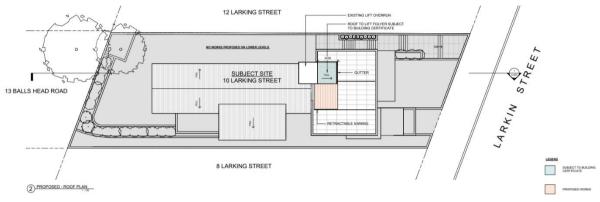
Proposed Roof Plan, Sheet Number A-003 Rev B
